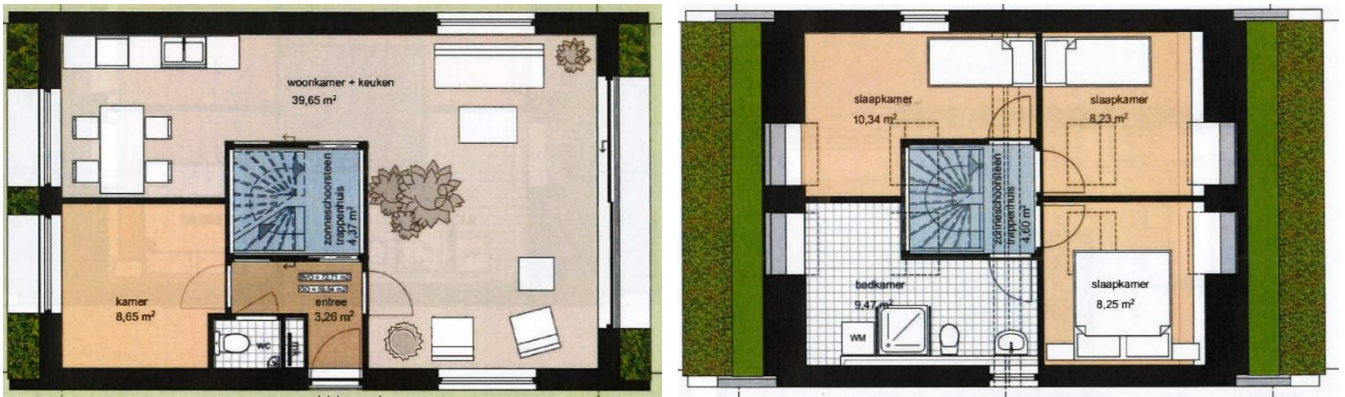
Floor plan Groenehaar, left: ground floor, right: first floor, source: tangramhuis.nl
